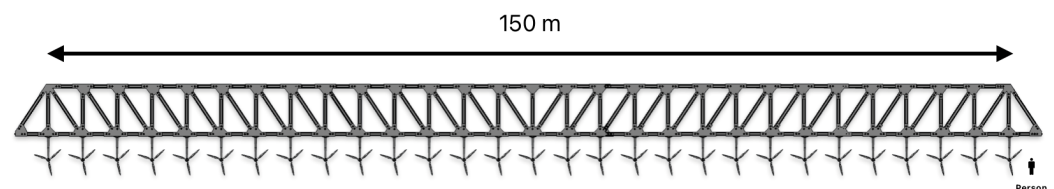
Bridge model with the support structure above sea level and the 29 axial-flow turbines hanging by cylindrical towers from a Pratt-truss bridge structure.
